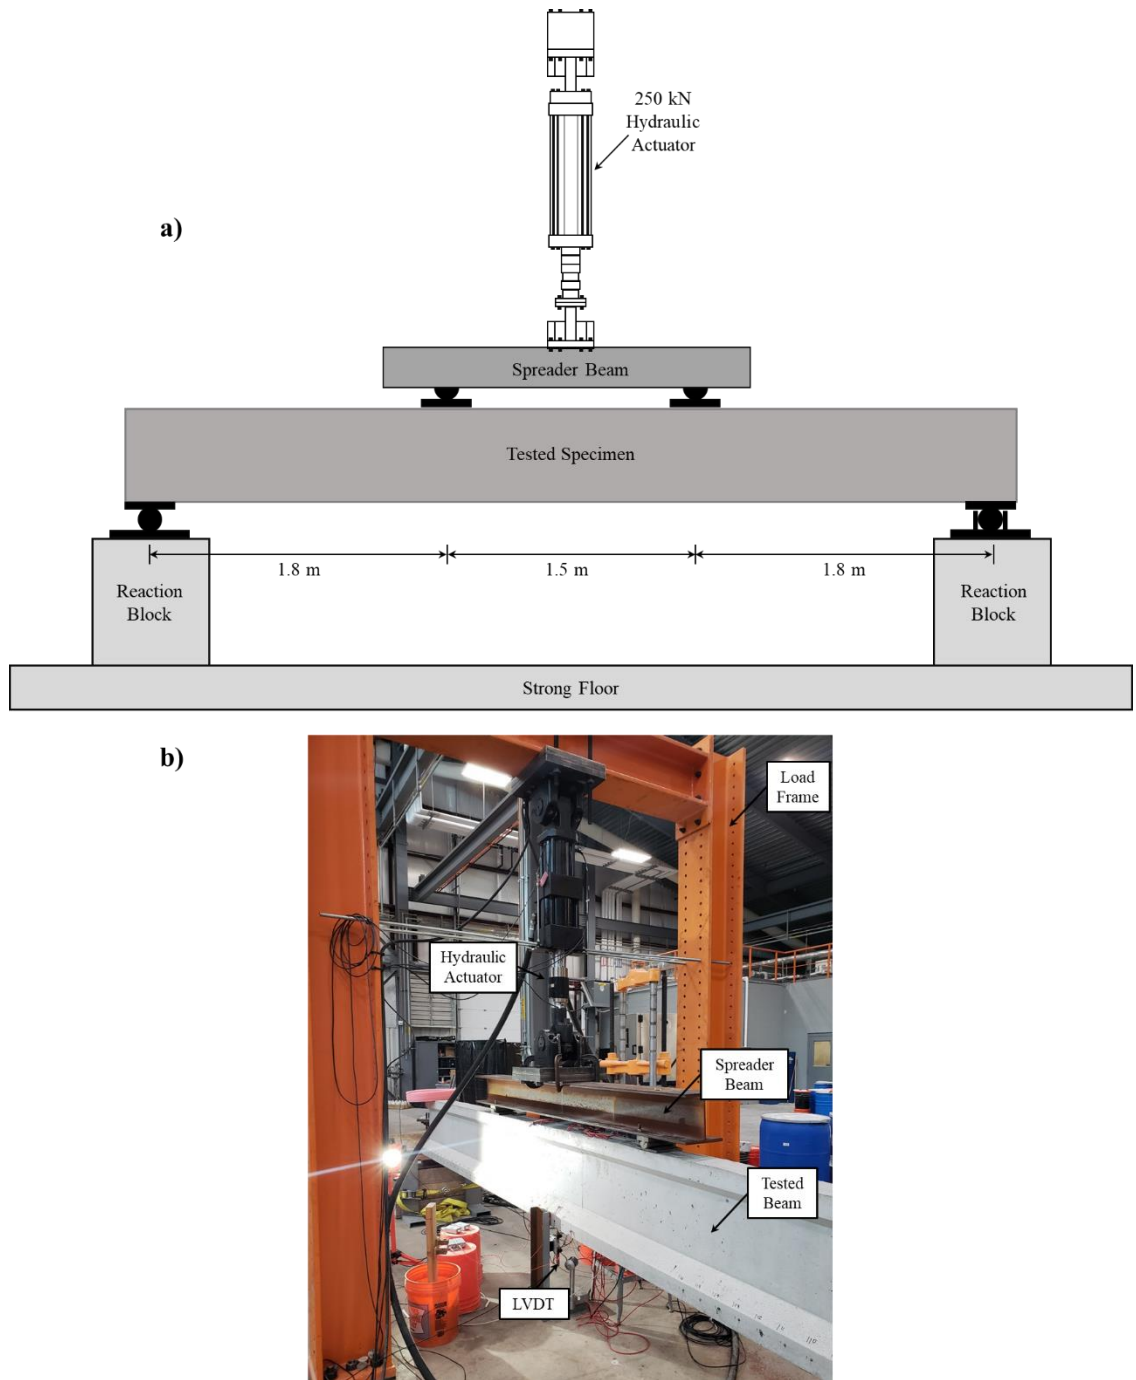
(a) Layout of the loading setup (b) test frame and the prestressed girder during load
